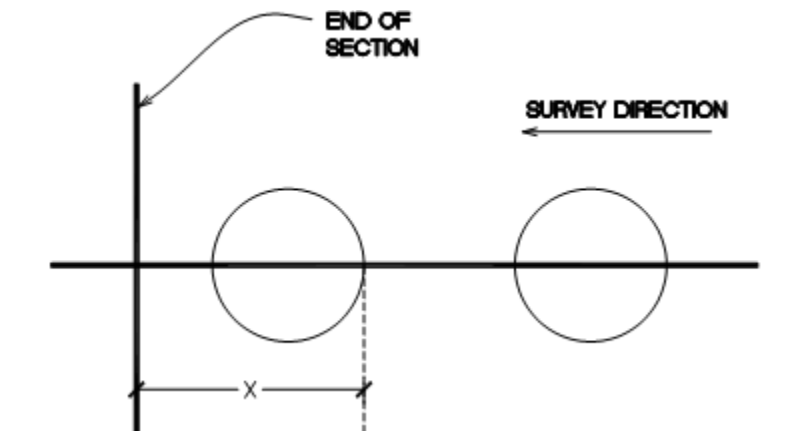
Back end of the front footpad is before the end of the test section when last reading is obtained.
